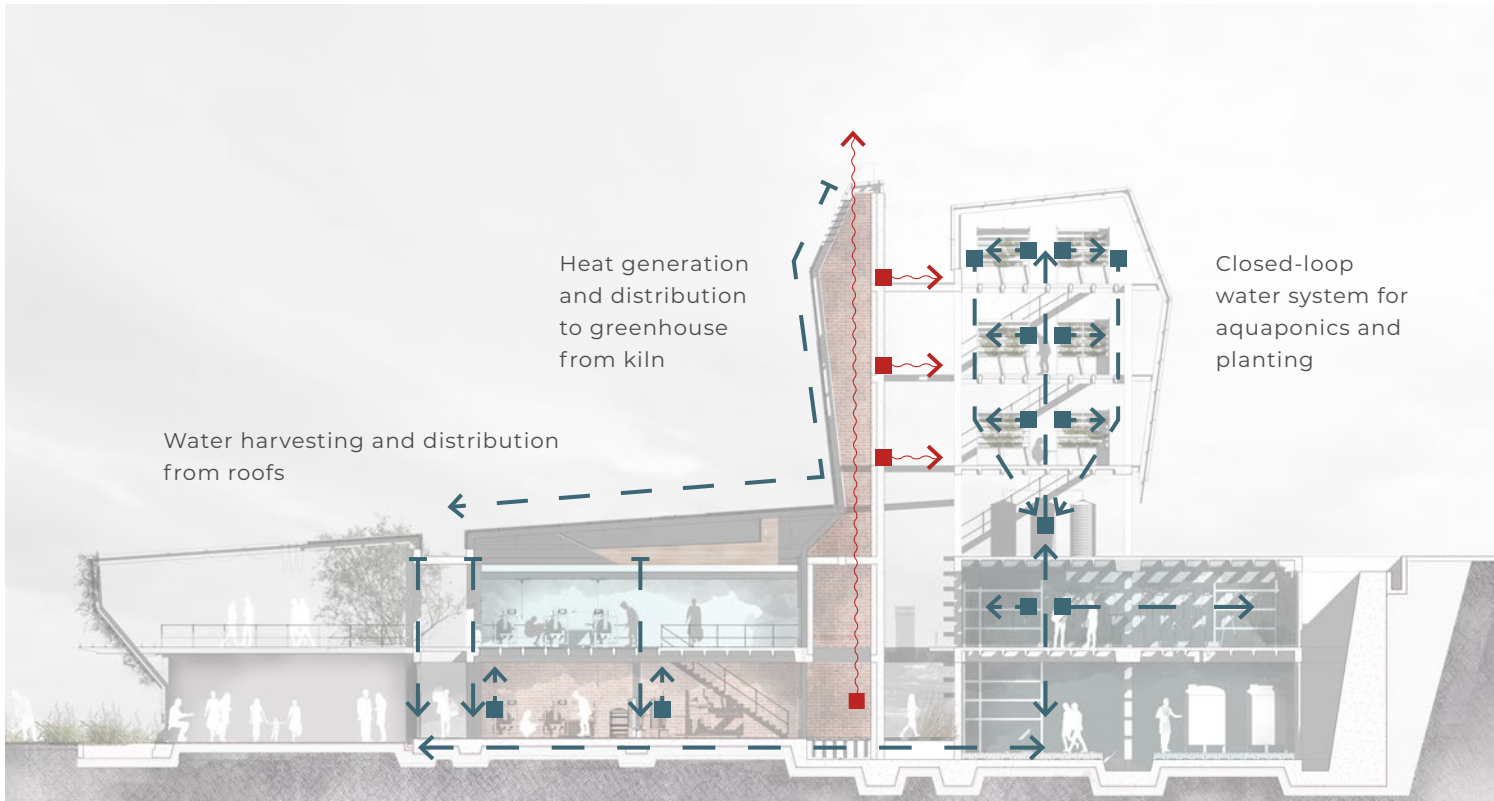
Regenerative systems section (Scale 1:300, original drawing 1:50) (Author:2018)
